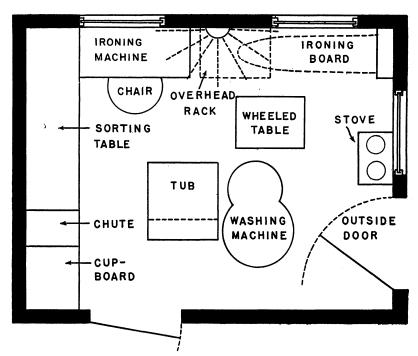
A laundry room (101/2 by 8 feet) with modern equipment placed for good routing of the work.
